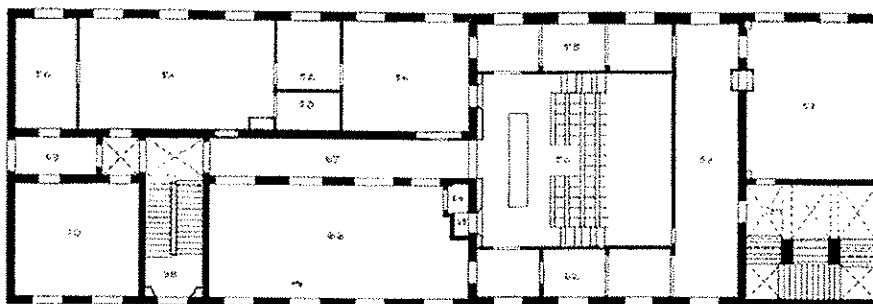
Plan of the second floor of the new physics building. The second floor was occupied of premises for teaching as well as Holtsmark's office and laboratory. No. 56 was the large auditorium that continued through the third floor (*NTH - Beretning for 5-året 1920-1925*, p. 206).
